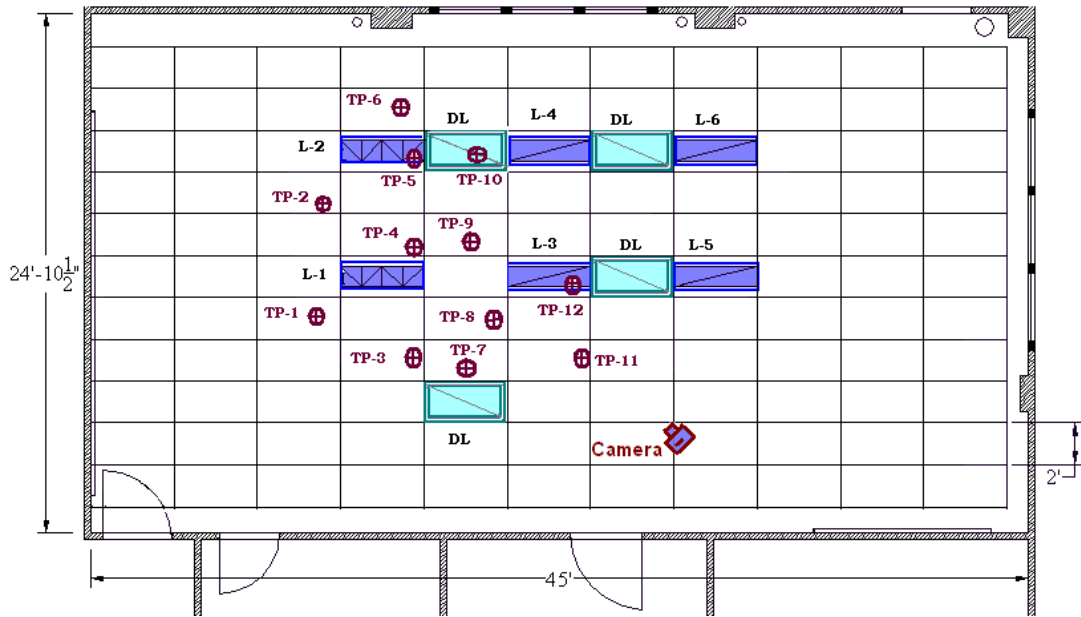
Ceiling plan of the lighting laboratory showing the locations of the luminaires and test points
